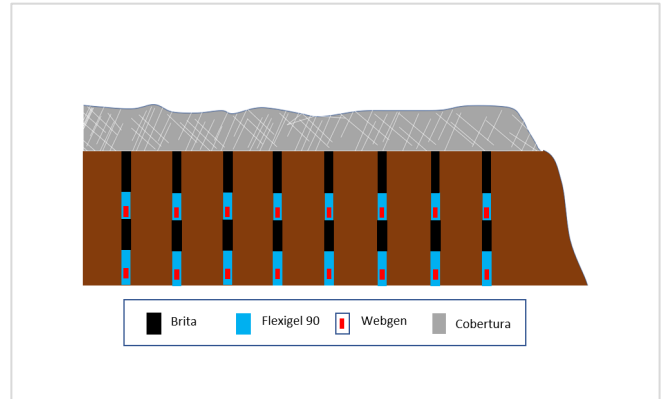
Fill material can be placed quickly and easily when machines can drive over wirelessly primed blastholes.
